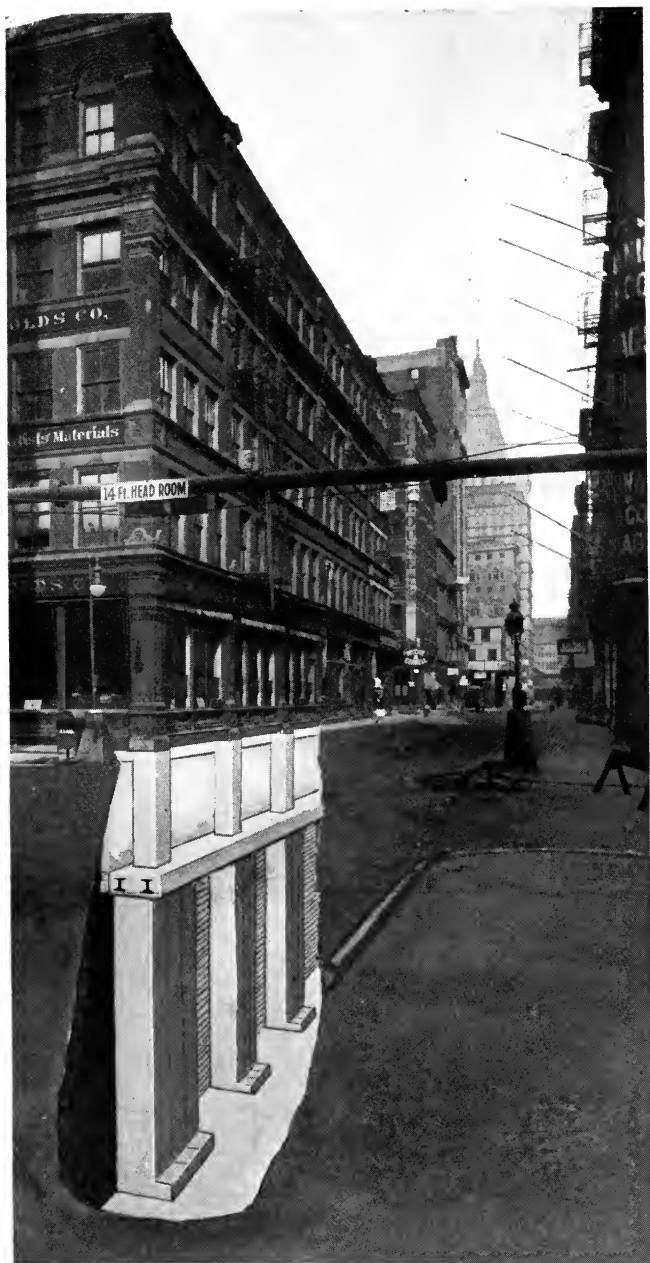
145-155 William Street, Showing Columns, Grillage,
